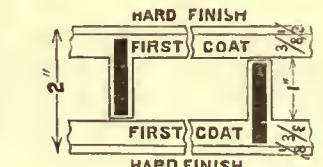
Section of double-faced, two-coat plastered partition, 2 inches thick, reinforced with bar.
